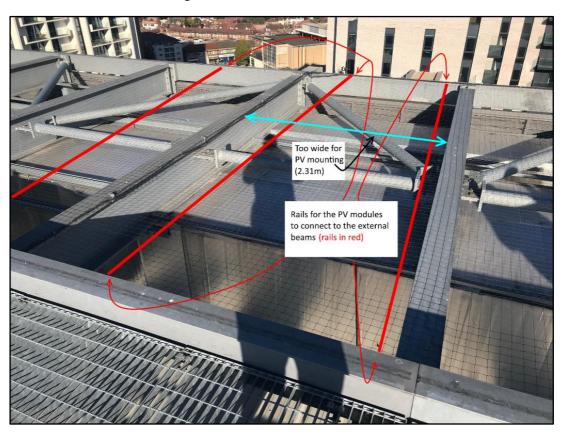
Proposed method for mounting external rails (to support PV panels on top)
